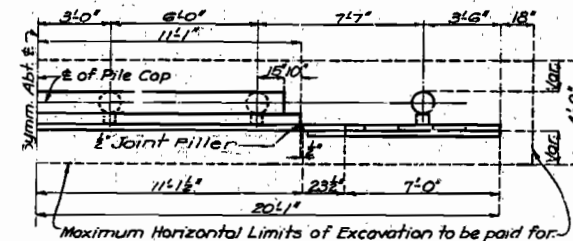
DETAIL OF INTERIOR BENT NO. REQUIRING DOUBLE BRACING
